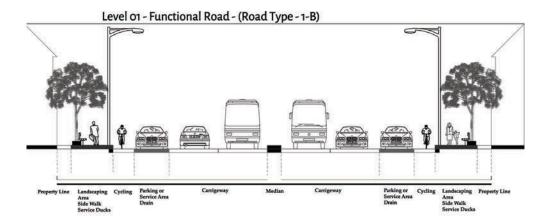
Cross section of a Level 01 – Functional Road - (Road Type - 1–B)
